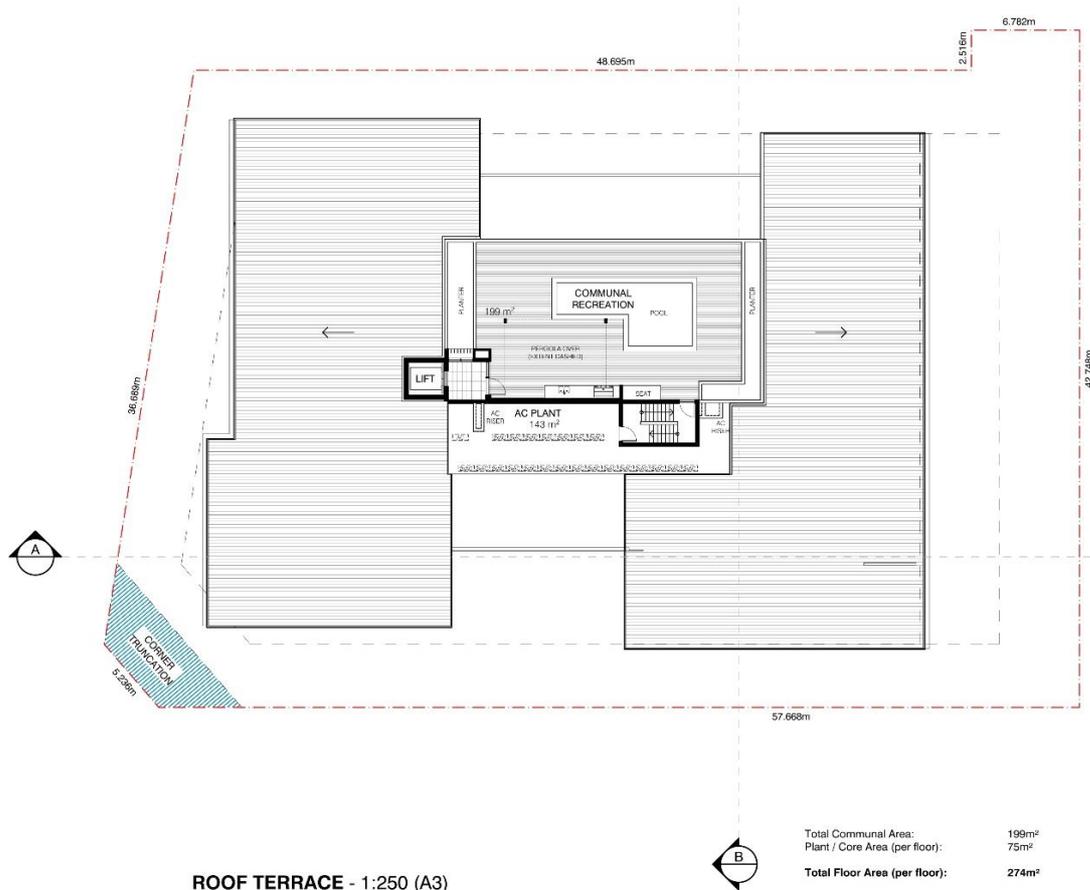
Proposed Roof Terrace Plan indicating how the rooftop shared recreational facilities proposed (pool, terrace etc.) are deeply inset from the perimeter edge of the roof structure itself. (Source: bda Architects)
